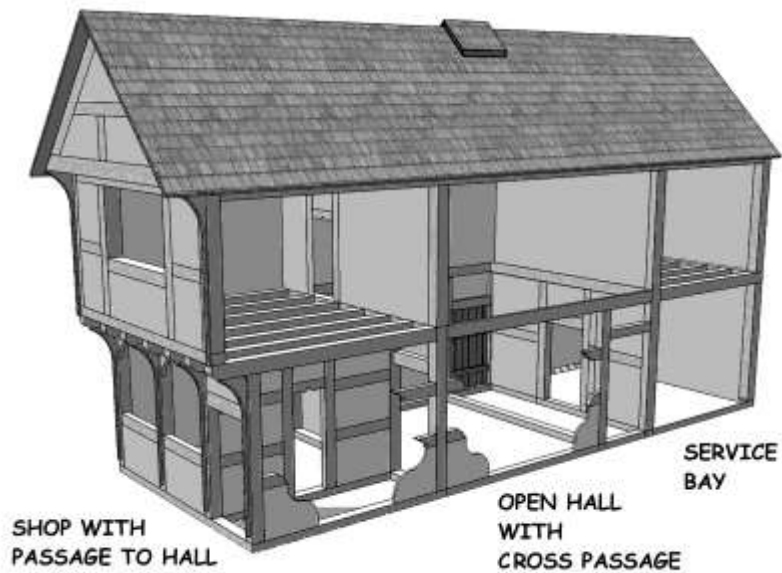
Weobley Bookshop, Broad Street (RCHME 34). Partial reconstruction to illustrate the primary layout of this hall house with shop front
